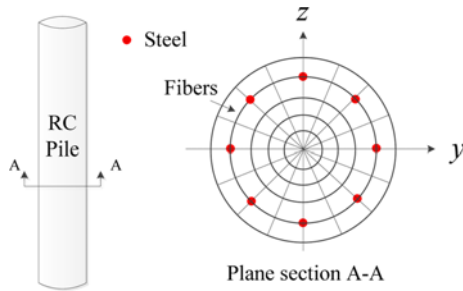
Fiber Element Discretization of the Plane Section of a Reinforced Concrete (RC) Pile
